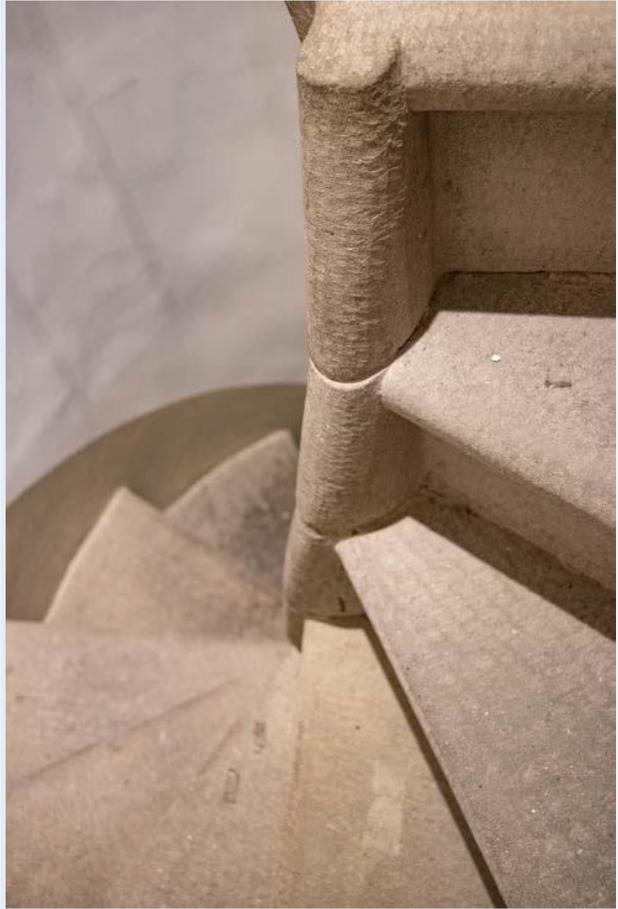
, 47, 48. Detail, top and side view of the stone helical staircase.
